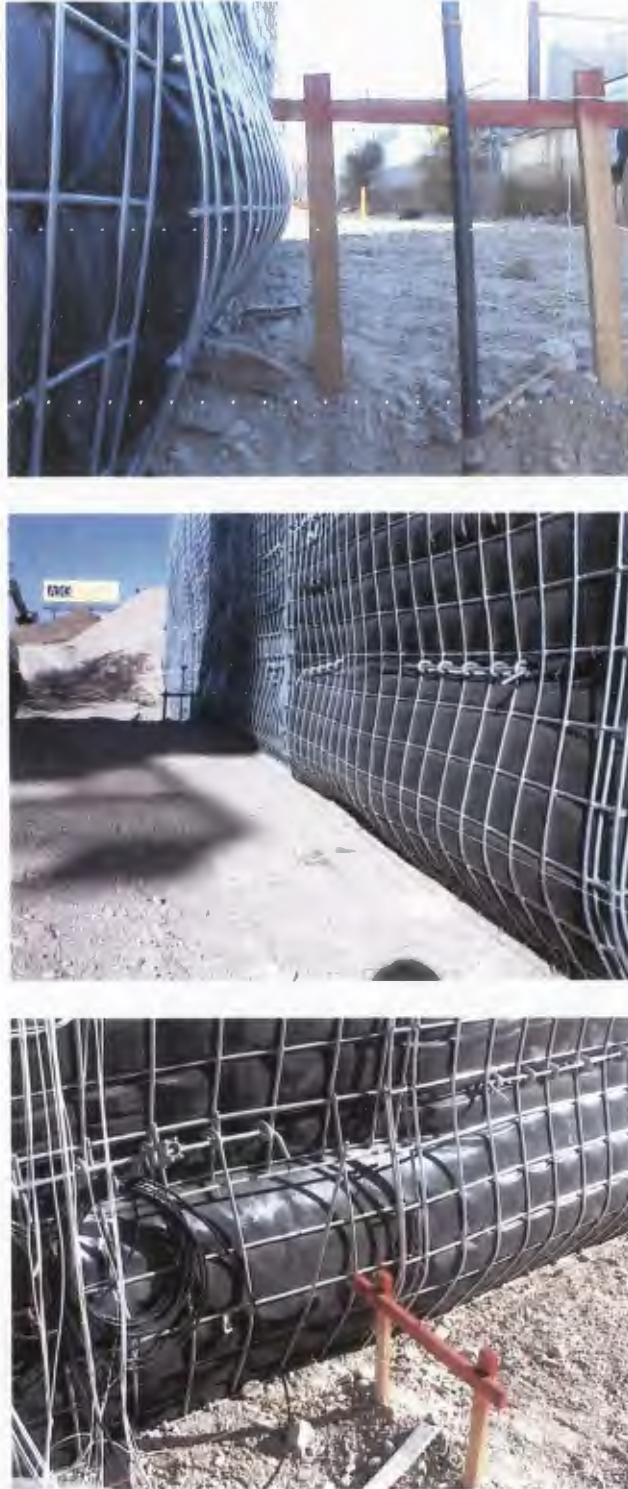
Photographs showing deformations and toe bulges of first-stage wall face during construction
